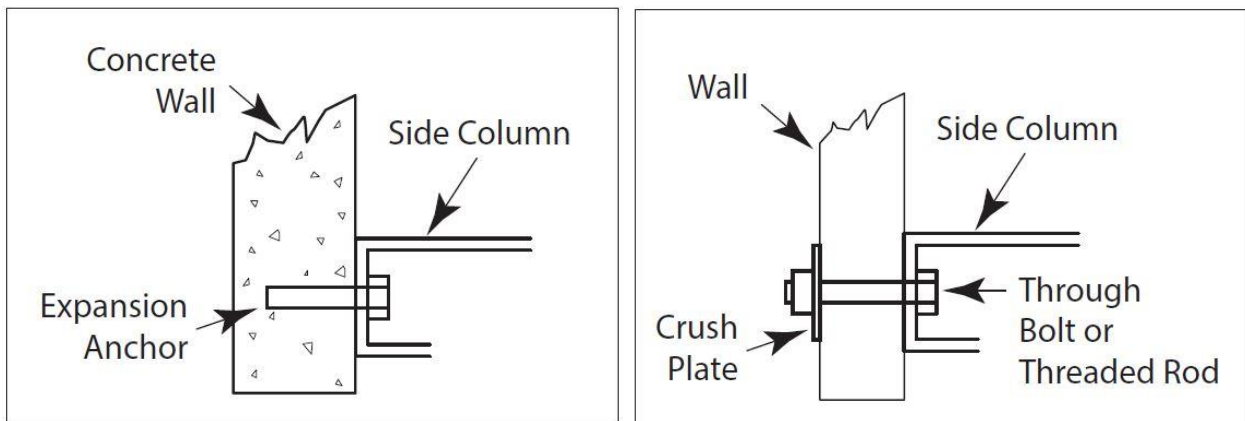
Concrete, Block, Brick or Insulated Panel Wall
